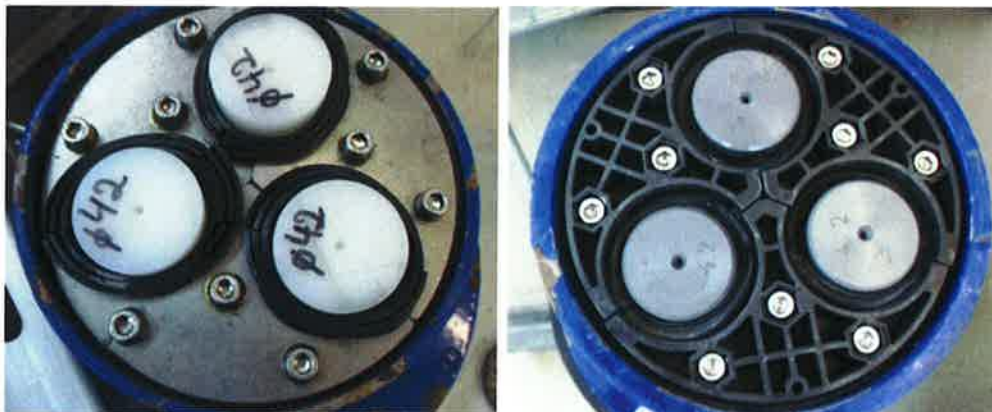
Top view of the the press seals (left: HRD150-SG-3/22-54; right: HRK150-SSG-3/24-54).
